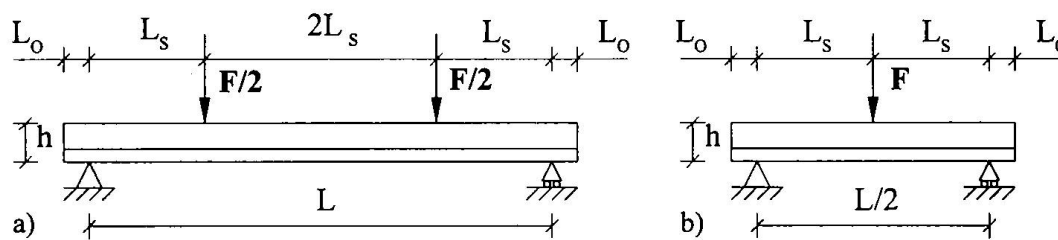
Load configurations for slab tests: a) two loads according EC4 and b) single central load
